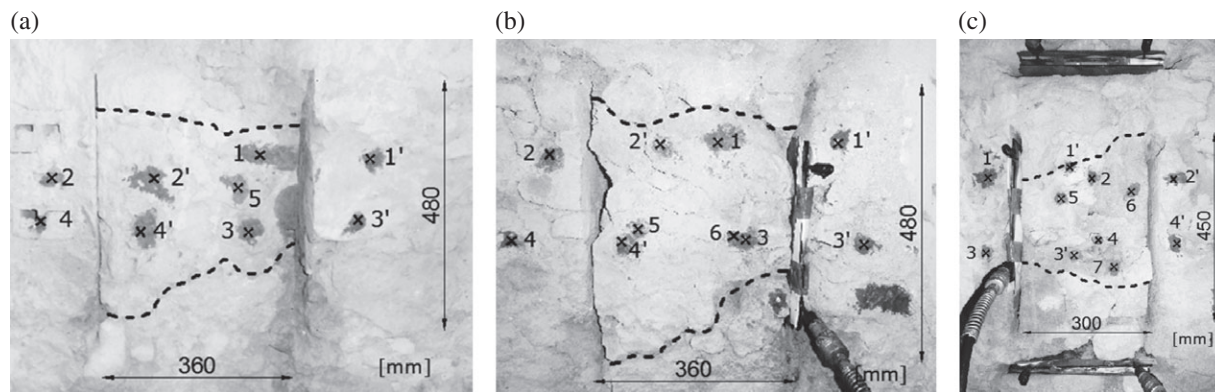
Frontal cracks on the masonry at the end of test: (a) G.1; (b) G.2; and (c) G.3.
